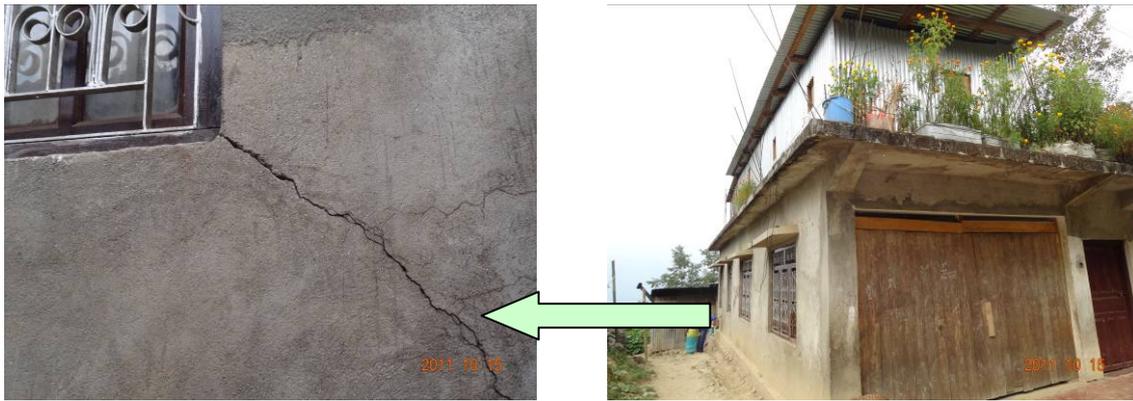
Shear cracks in the infill brick masonry wall of RC building.
